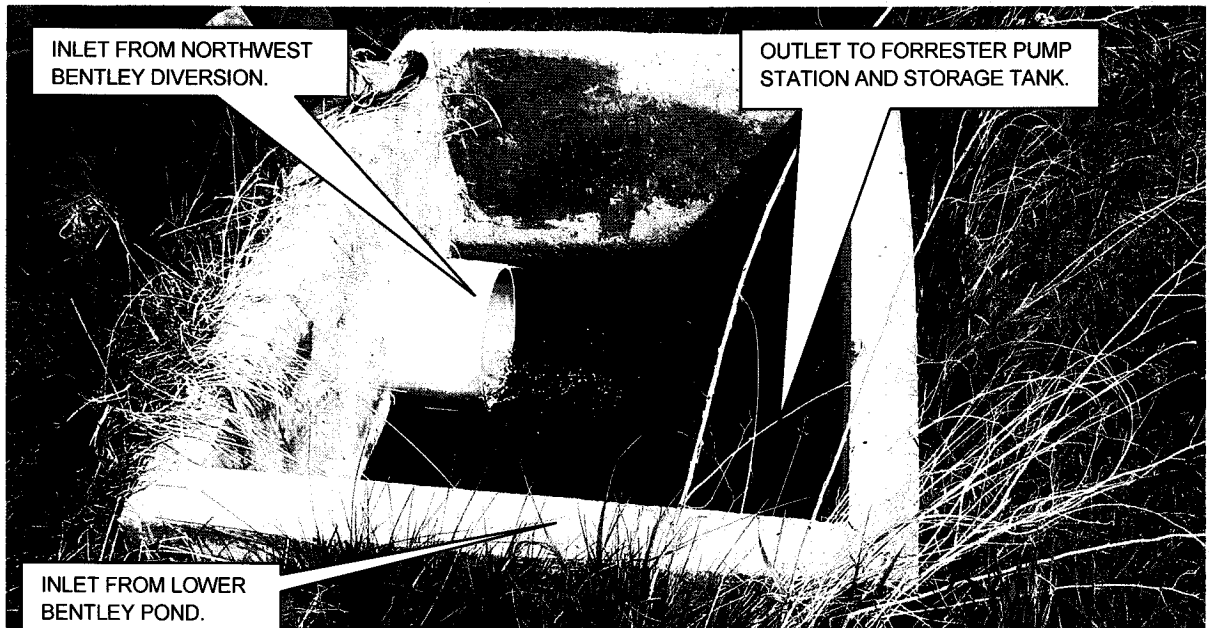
Diversion box on the Bentley that transfers water from the northwest Bentley diversion box and the northern outlet of the lower pond.
